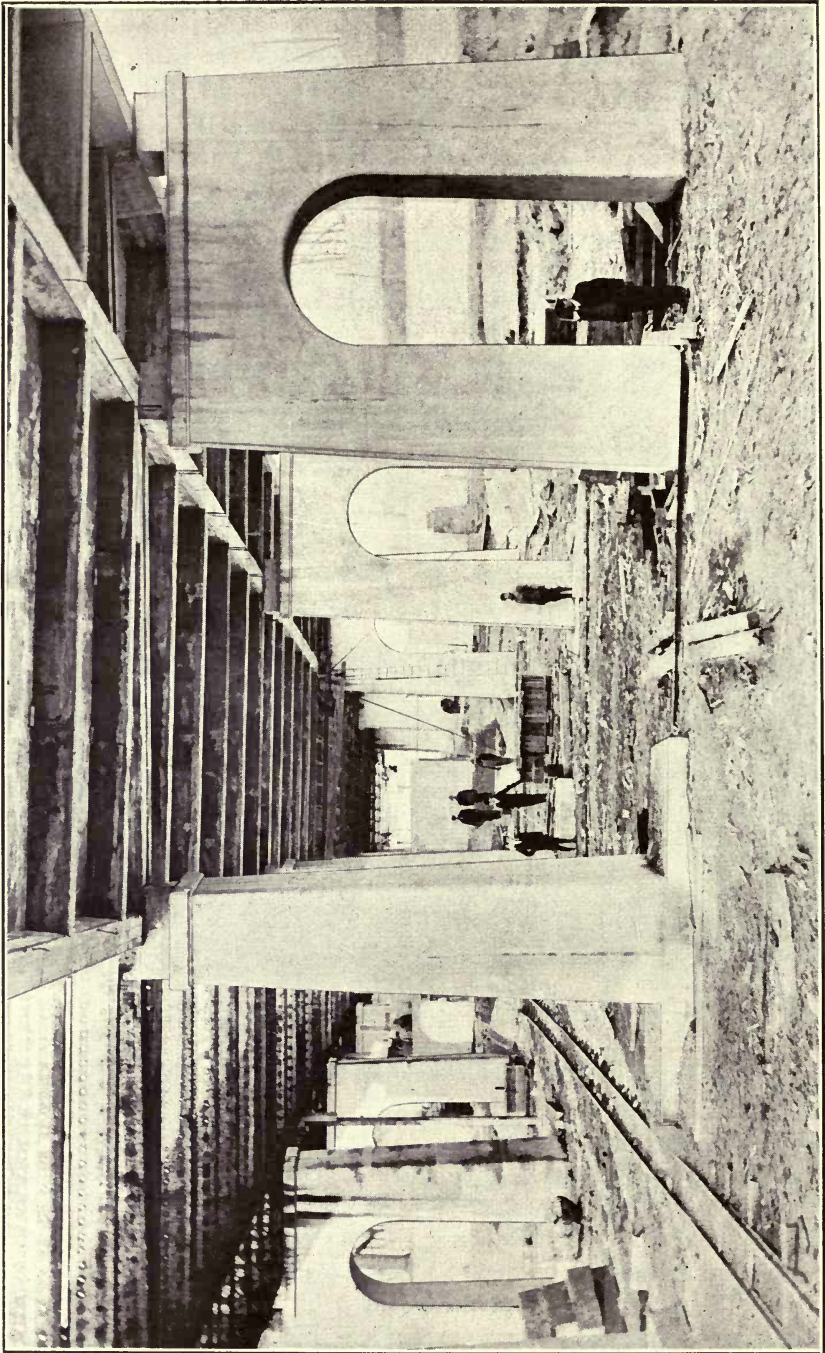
STEEL GIRDERS ENCASED IN CONCRETE, FIRST AVENUE VIADUCT, L. I. R. R.
